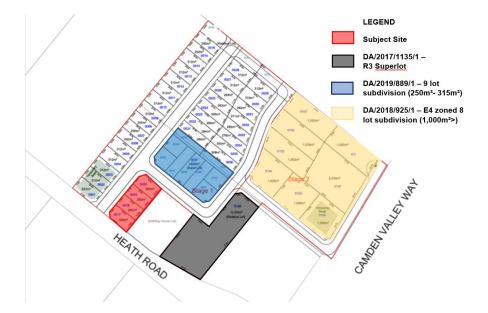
Subdivision Layout Plan (DA/2017/1135/3)
